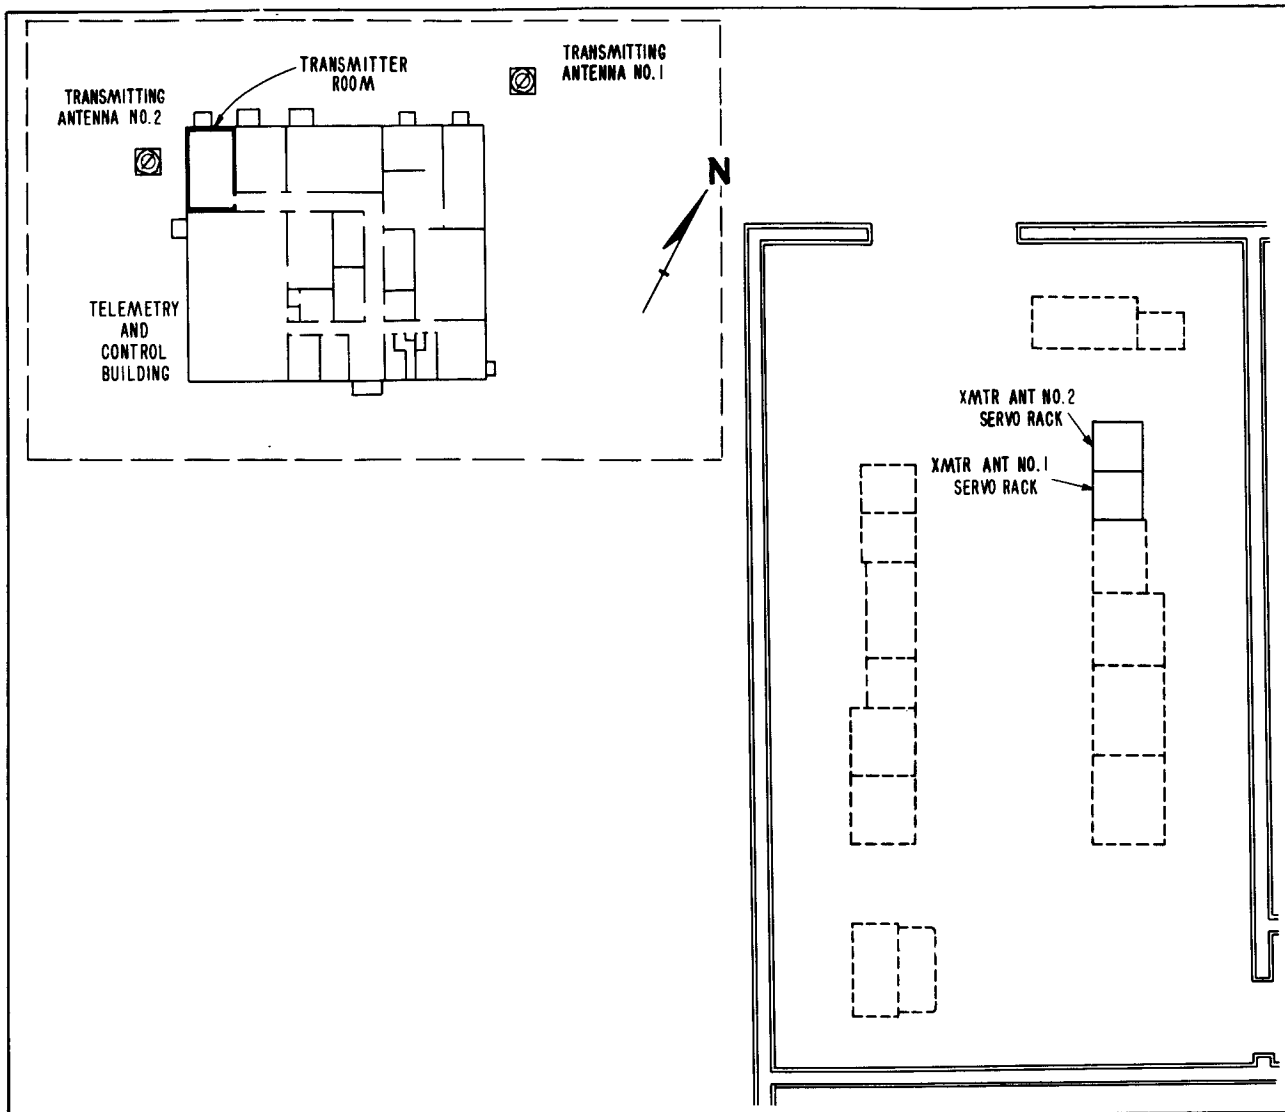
Acquisition System Equipment Layout, Telemetry and Control Building, Coopers Island
